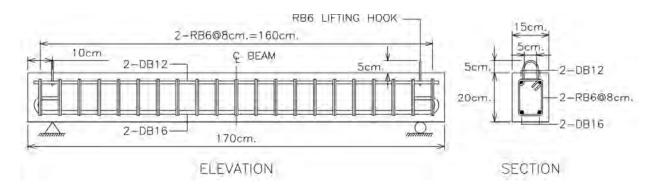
Drawings of specimen & arrangement of reinforcement.
